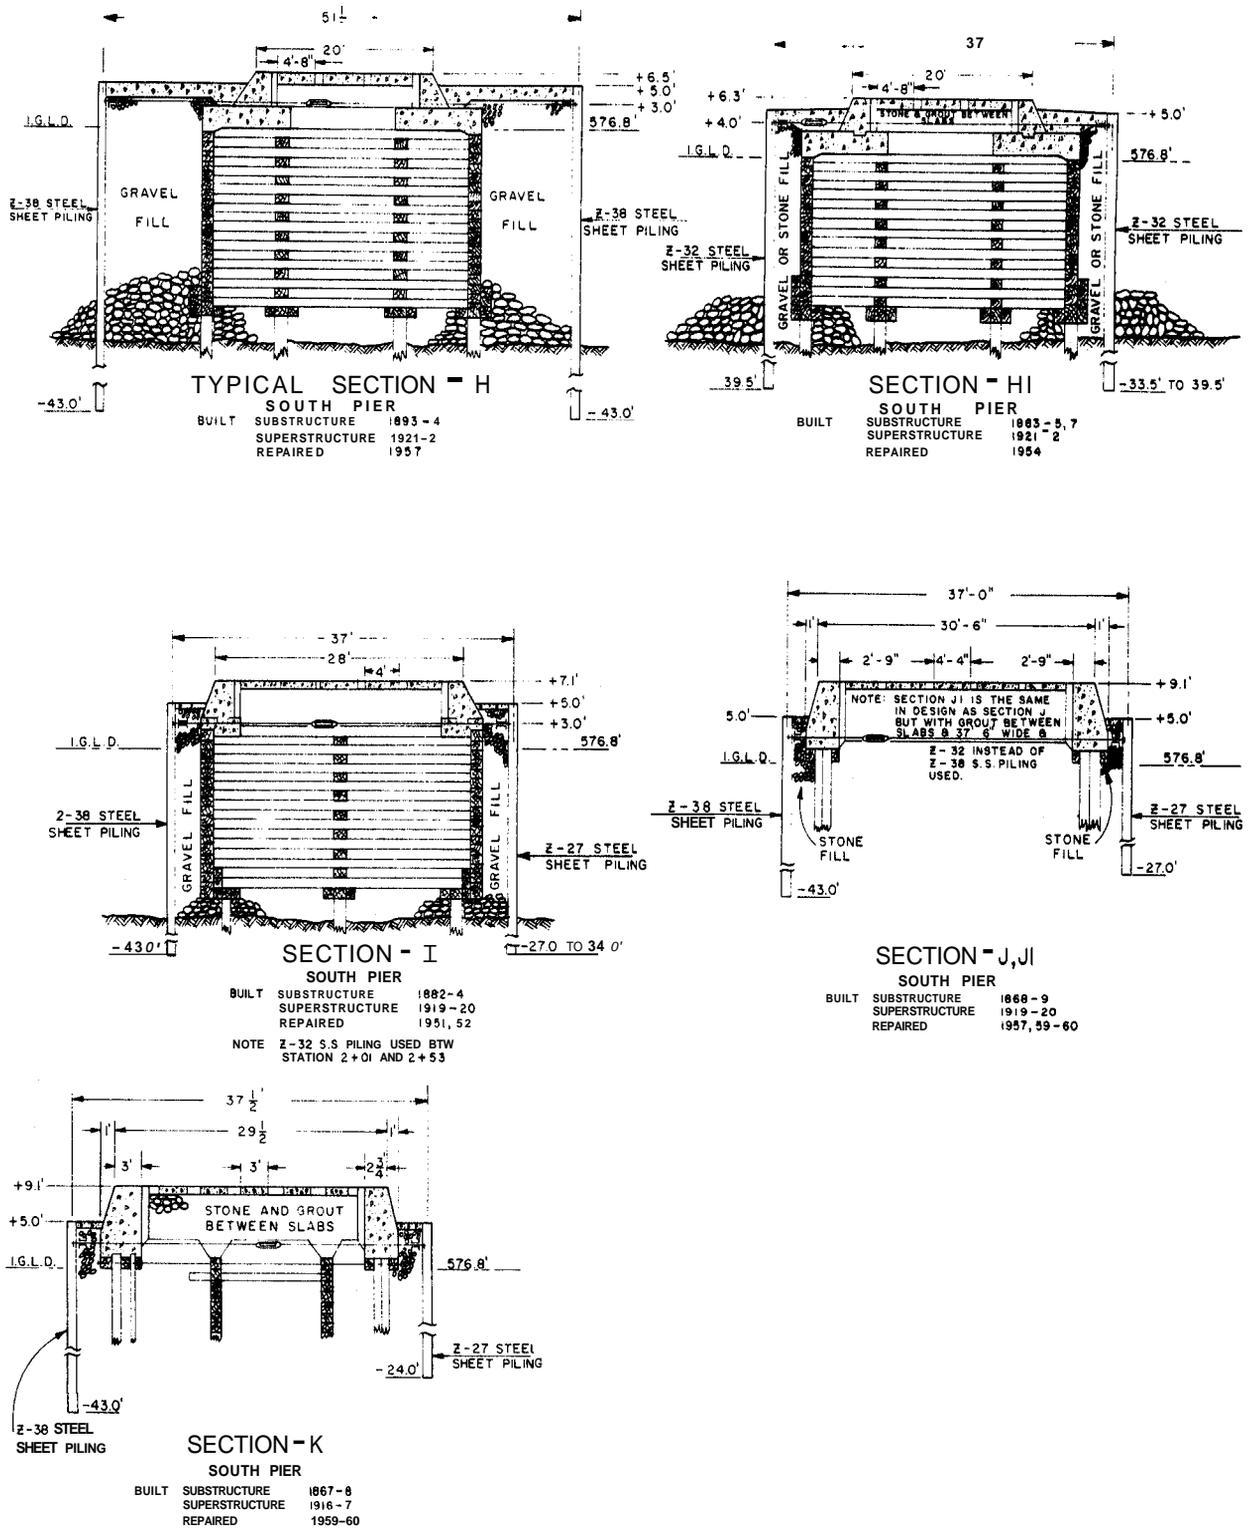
Typical south pier cross sections, Grand Haven Harbor, Michigan
